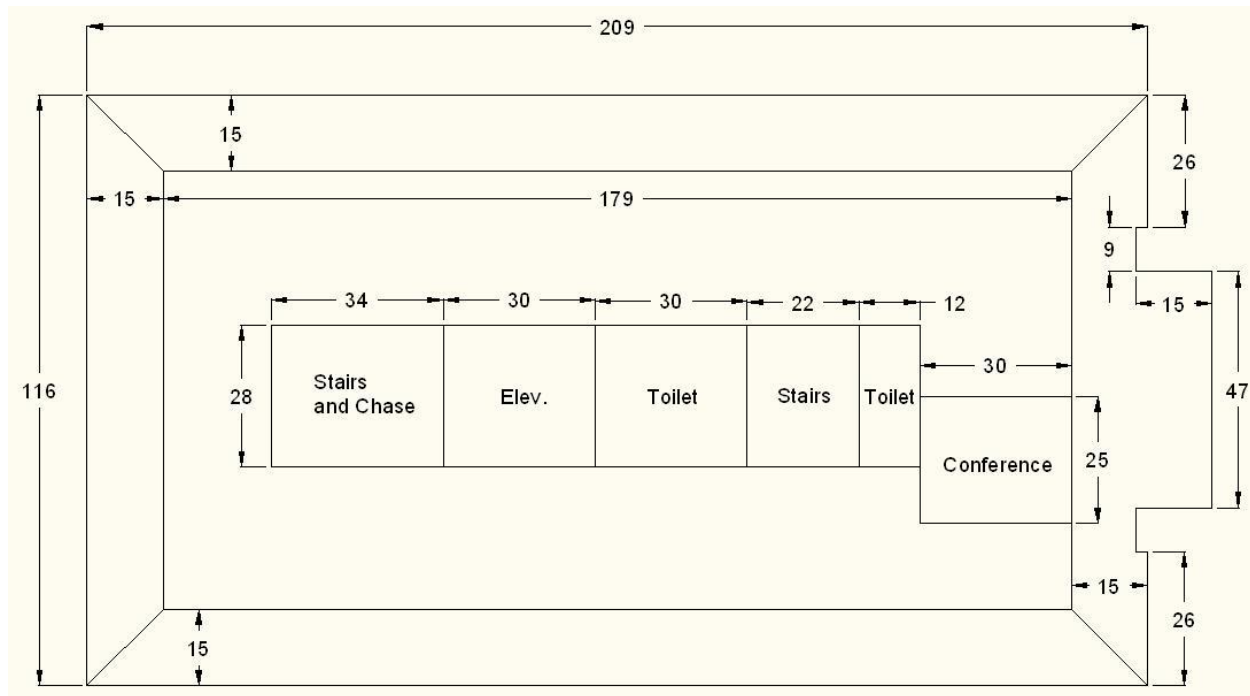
Tenant floor plan of core and perimeter zones (Case Study IV).
